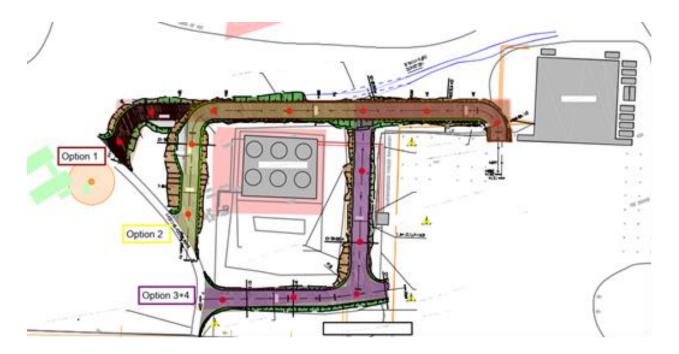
Access Road Options and Indicative Trial Pit Locations
